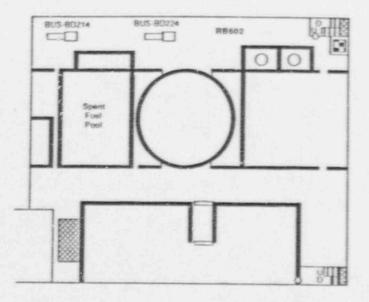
Limerick 2 Reactor Building, Elevation 313'
